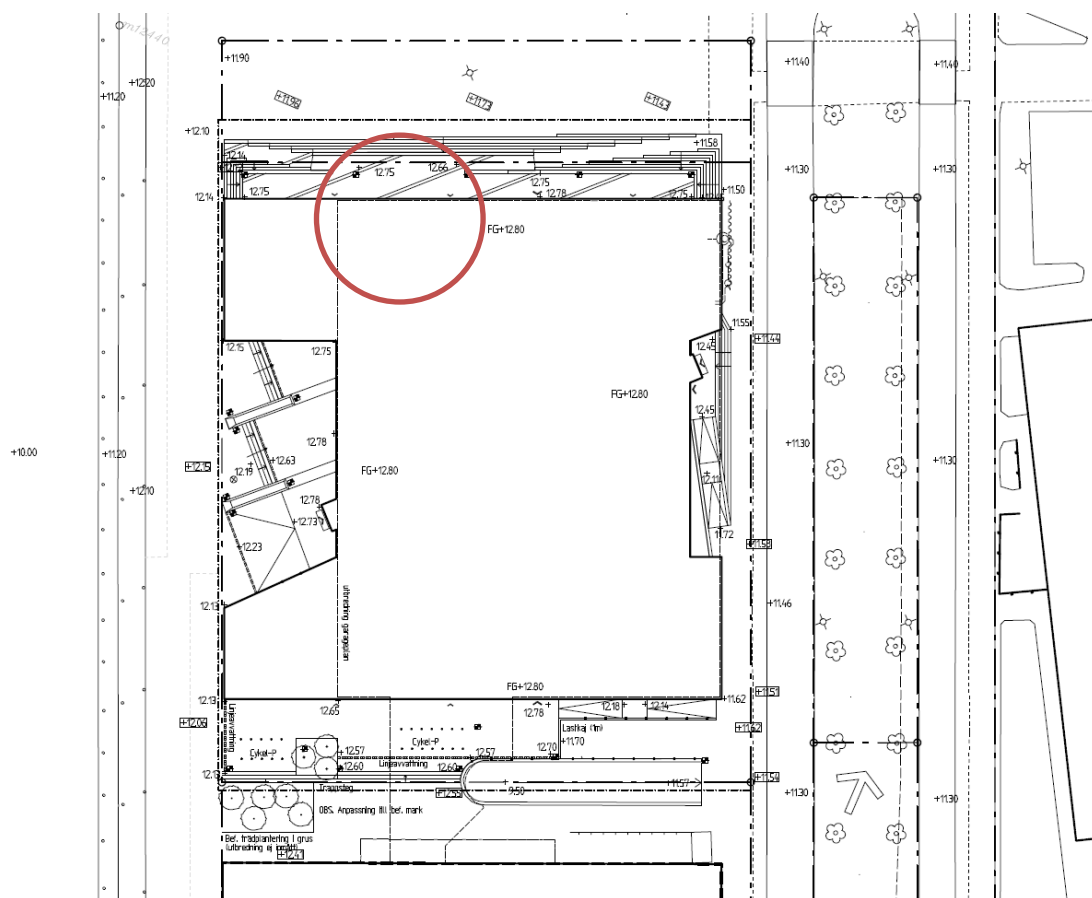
Site plan with studied part marked out (Liljewall Architects 2012).
